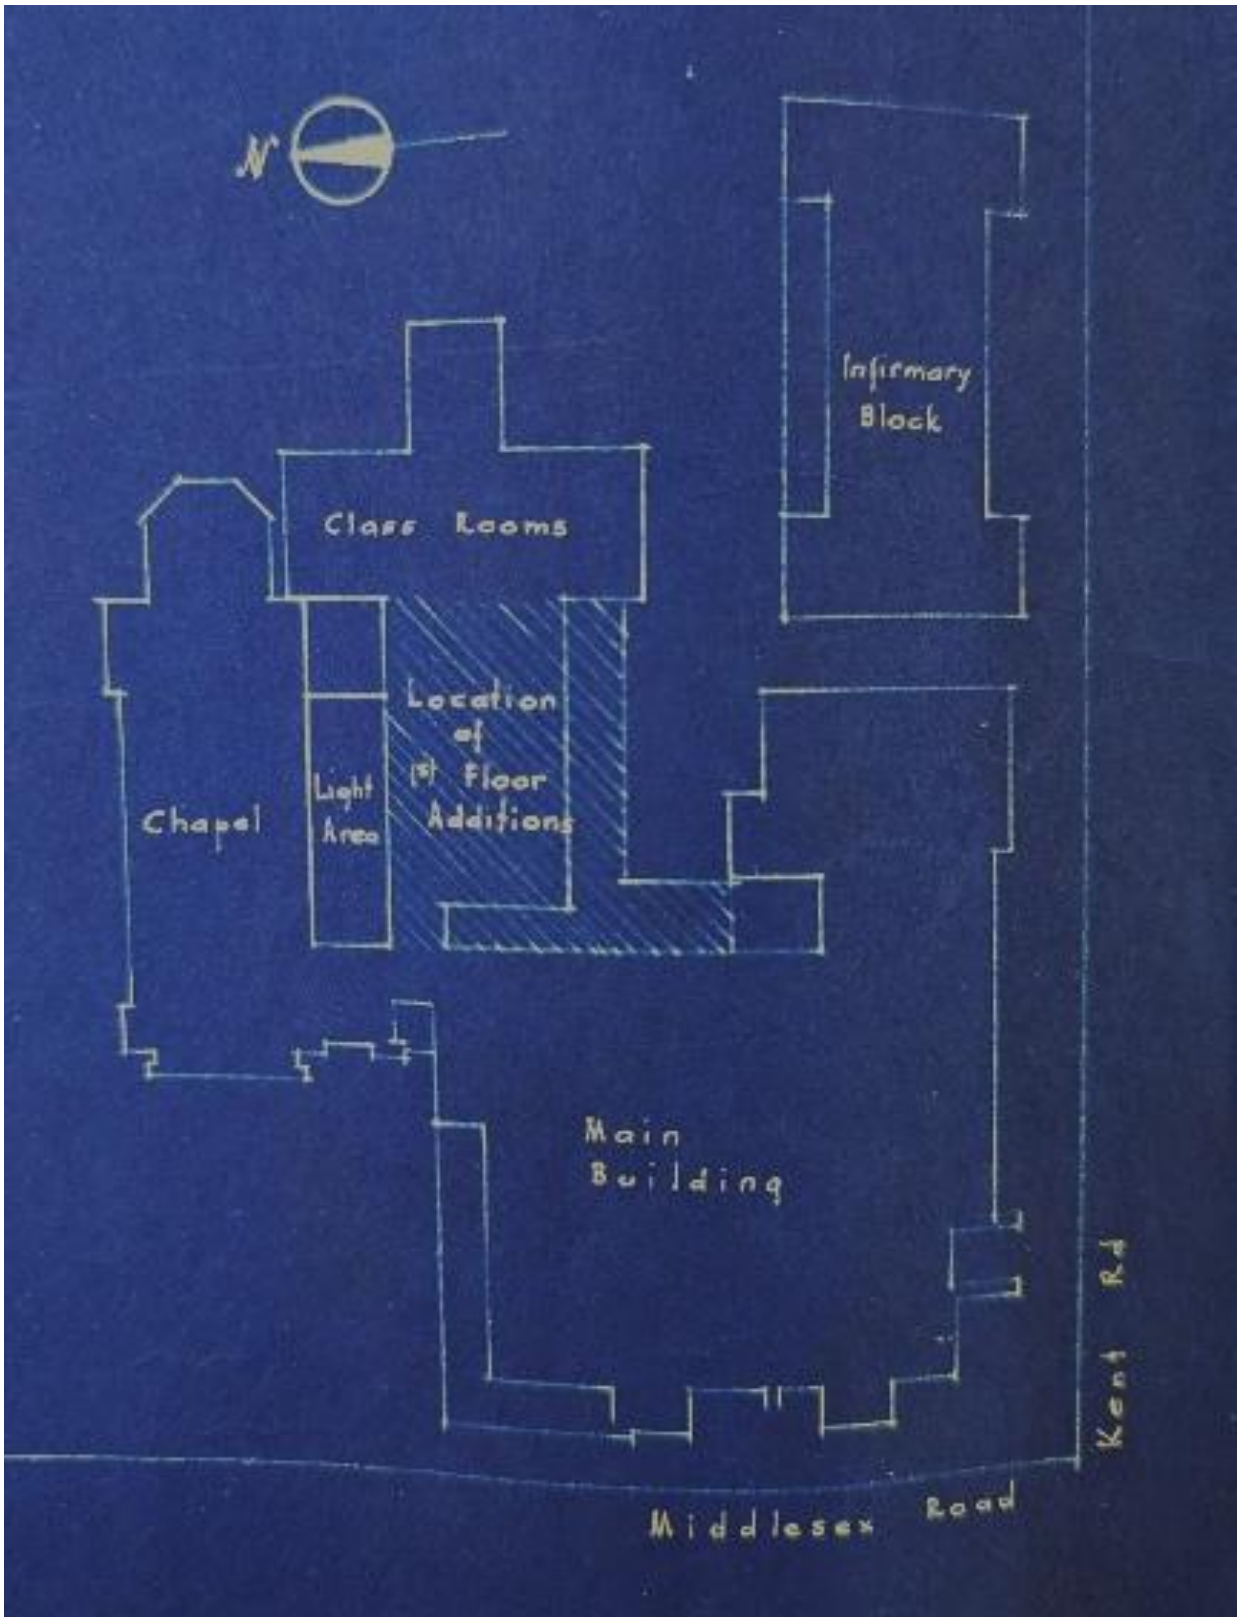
Block plan, 1938, showing the first-floor additions to c. 1901 addition (north is at left)
